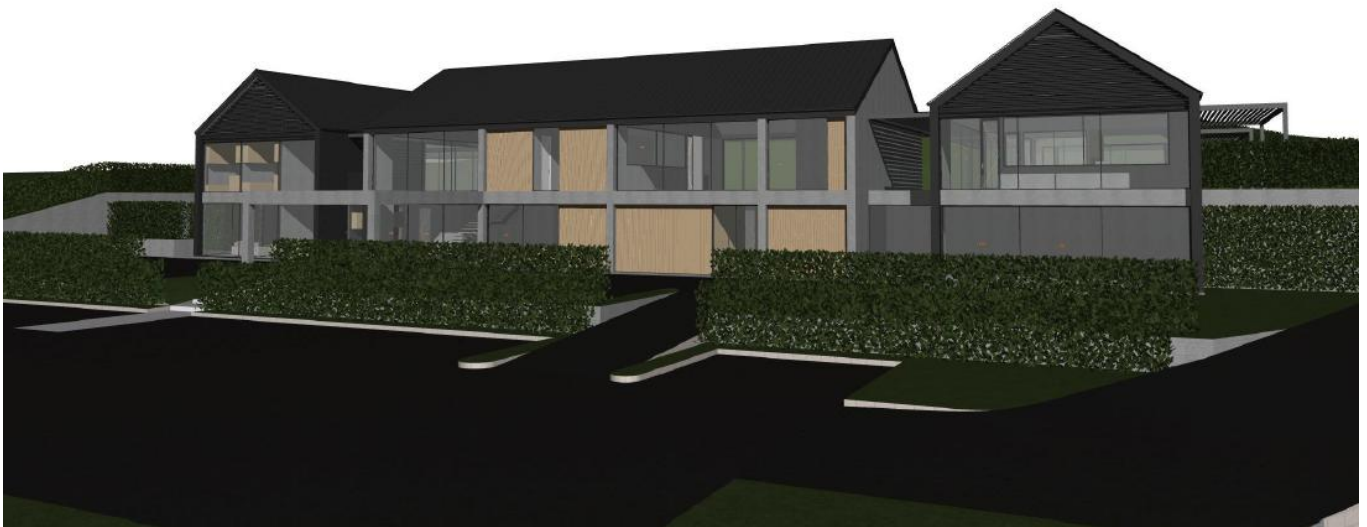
3D montage of concept plans (Source: Smith Architects)
